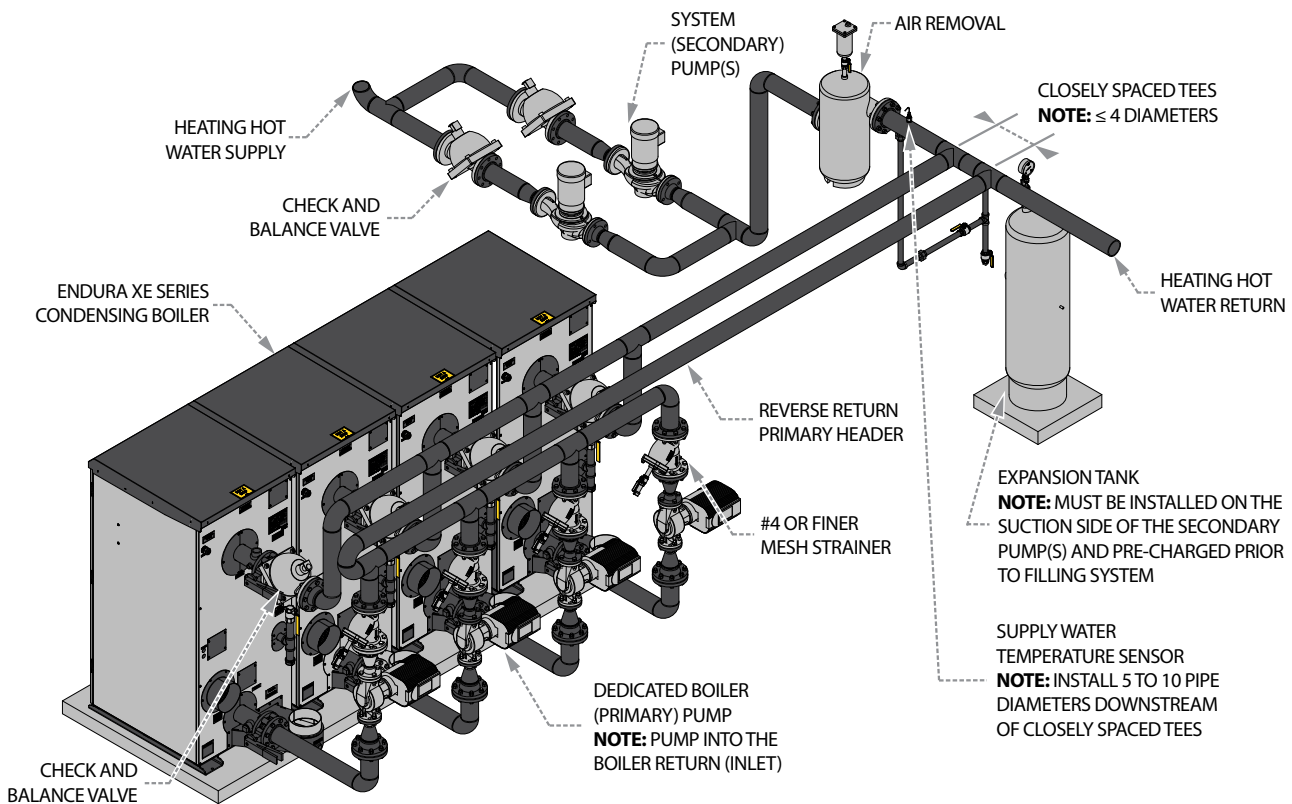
SAMPLE PIPING LAYOUT, PRIMARY - SECONDARY PIPING; MULTIPLE BOILERS
